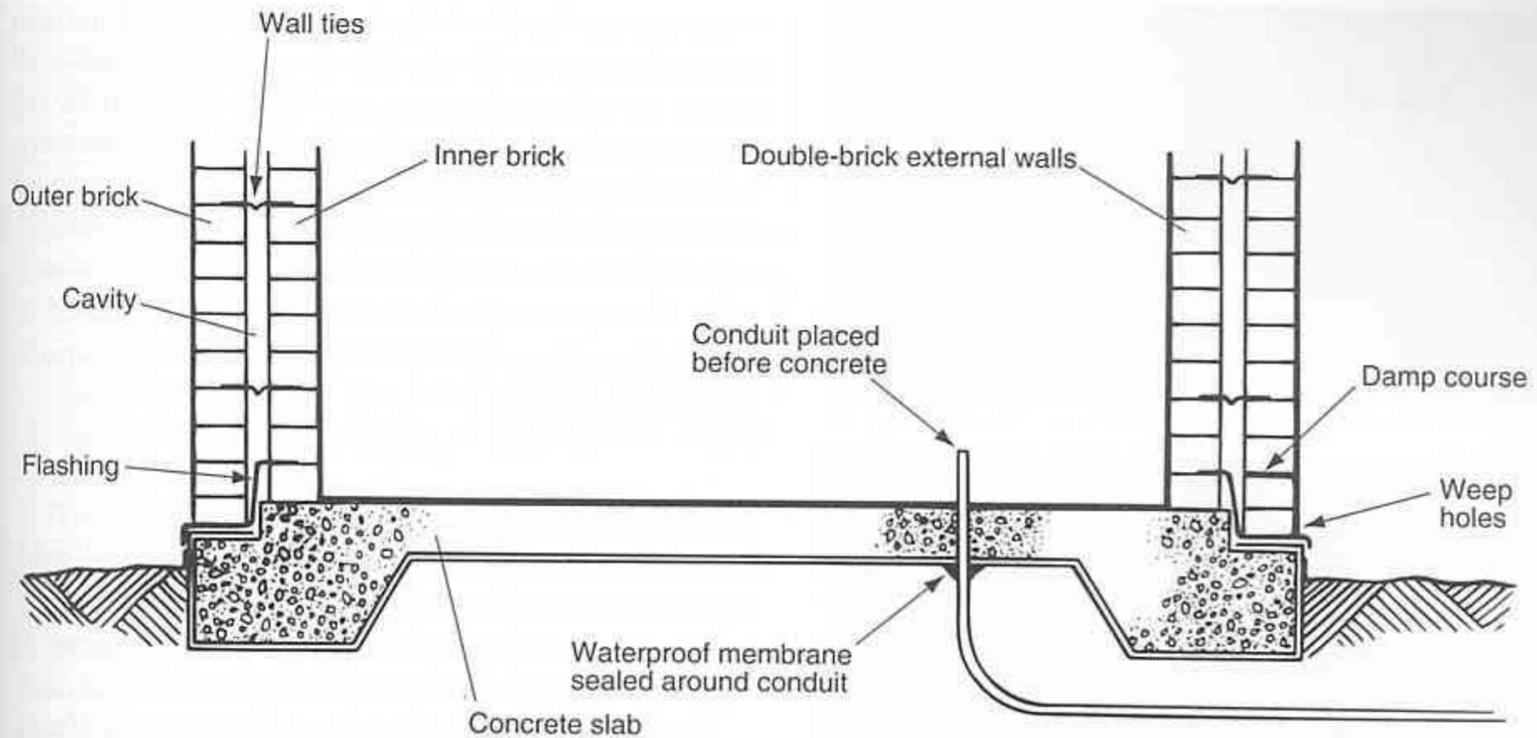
(b) Concrete slab footings WORKCOVER AUTHORITY OF NSW
